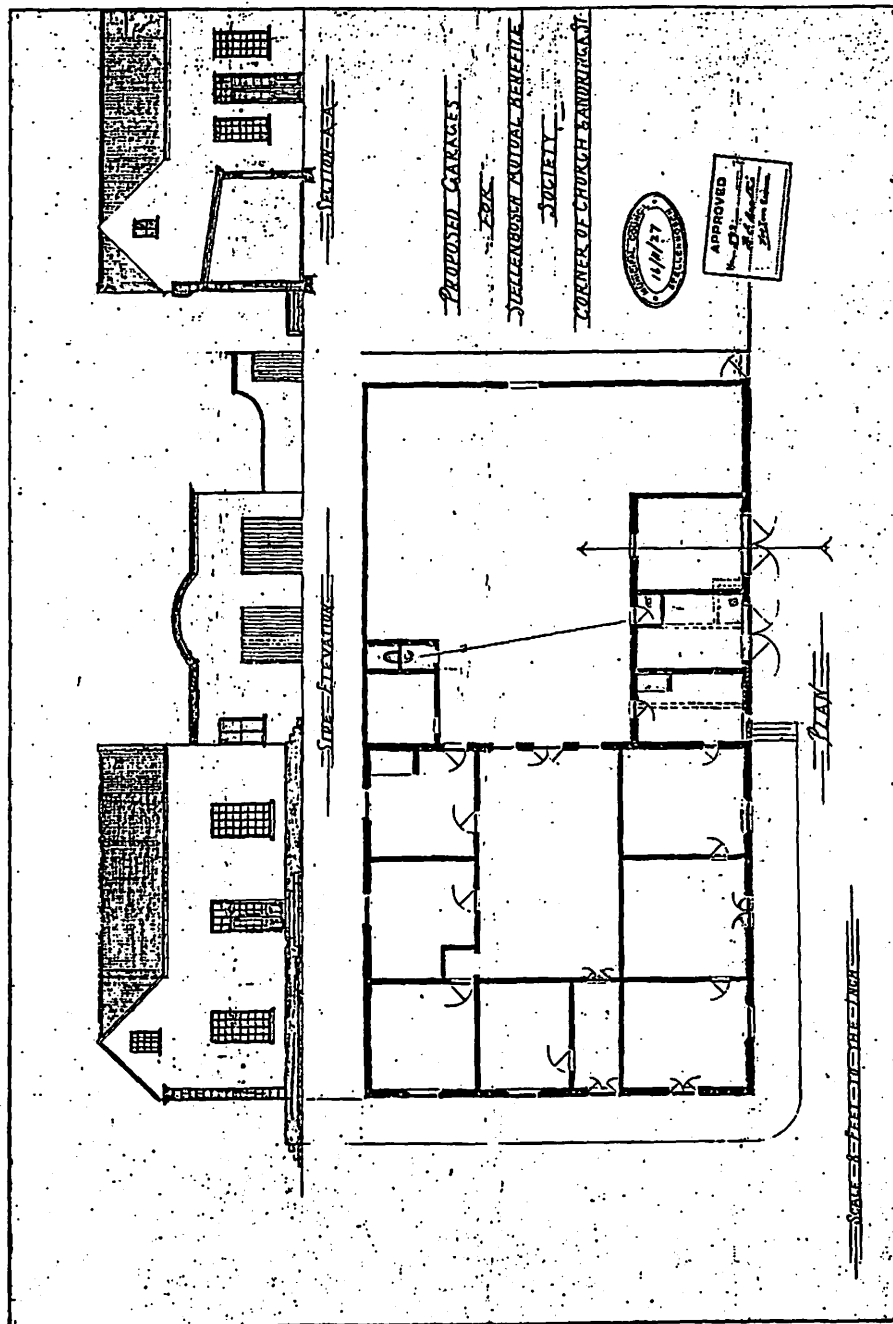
A plan of 1927 showing the groundplan and western elevation of the Victorianised dwelling (Stellenbosch Municipality).
